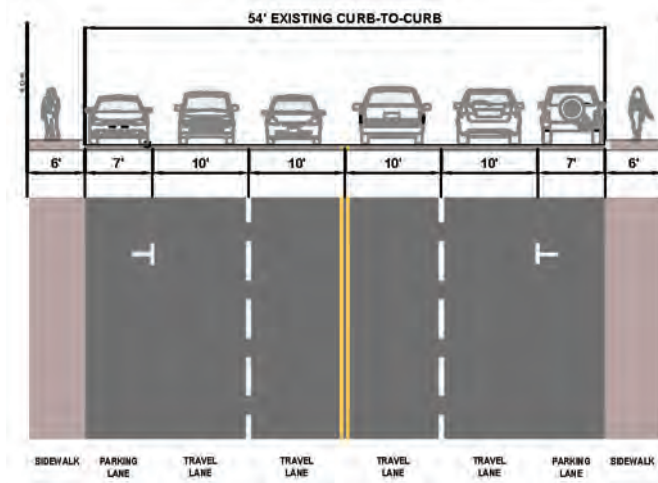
Bay Road Existing Typical Section From Second Avenue To Fifth Avenue
